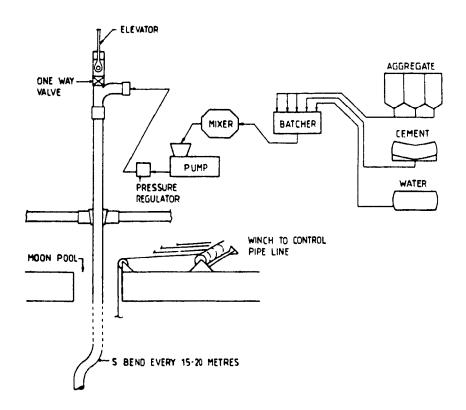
TYPICAL PUMP LINE ARRANGEMENT FOR UNDERWATER CONCRETING<sup>2</sup>
